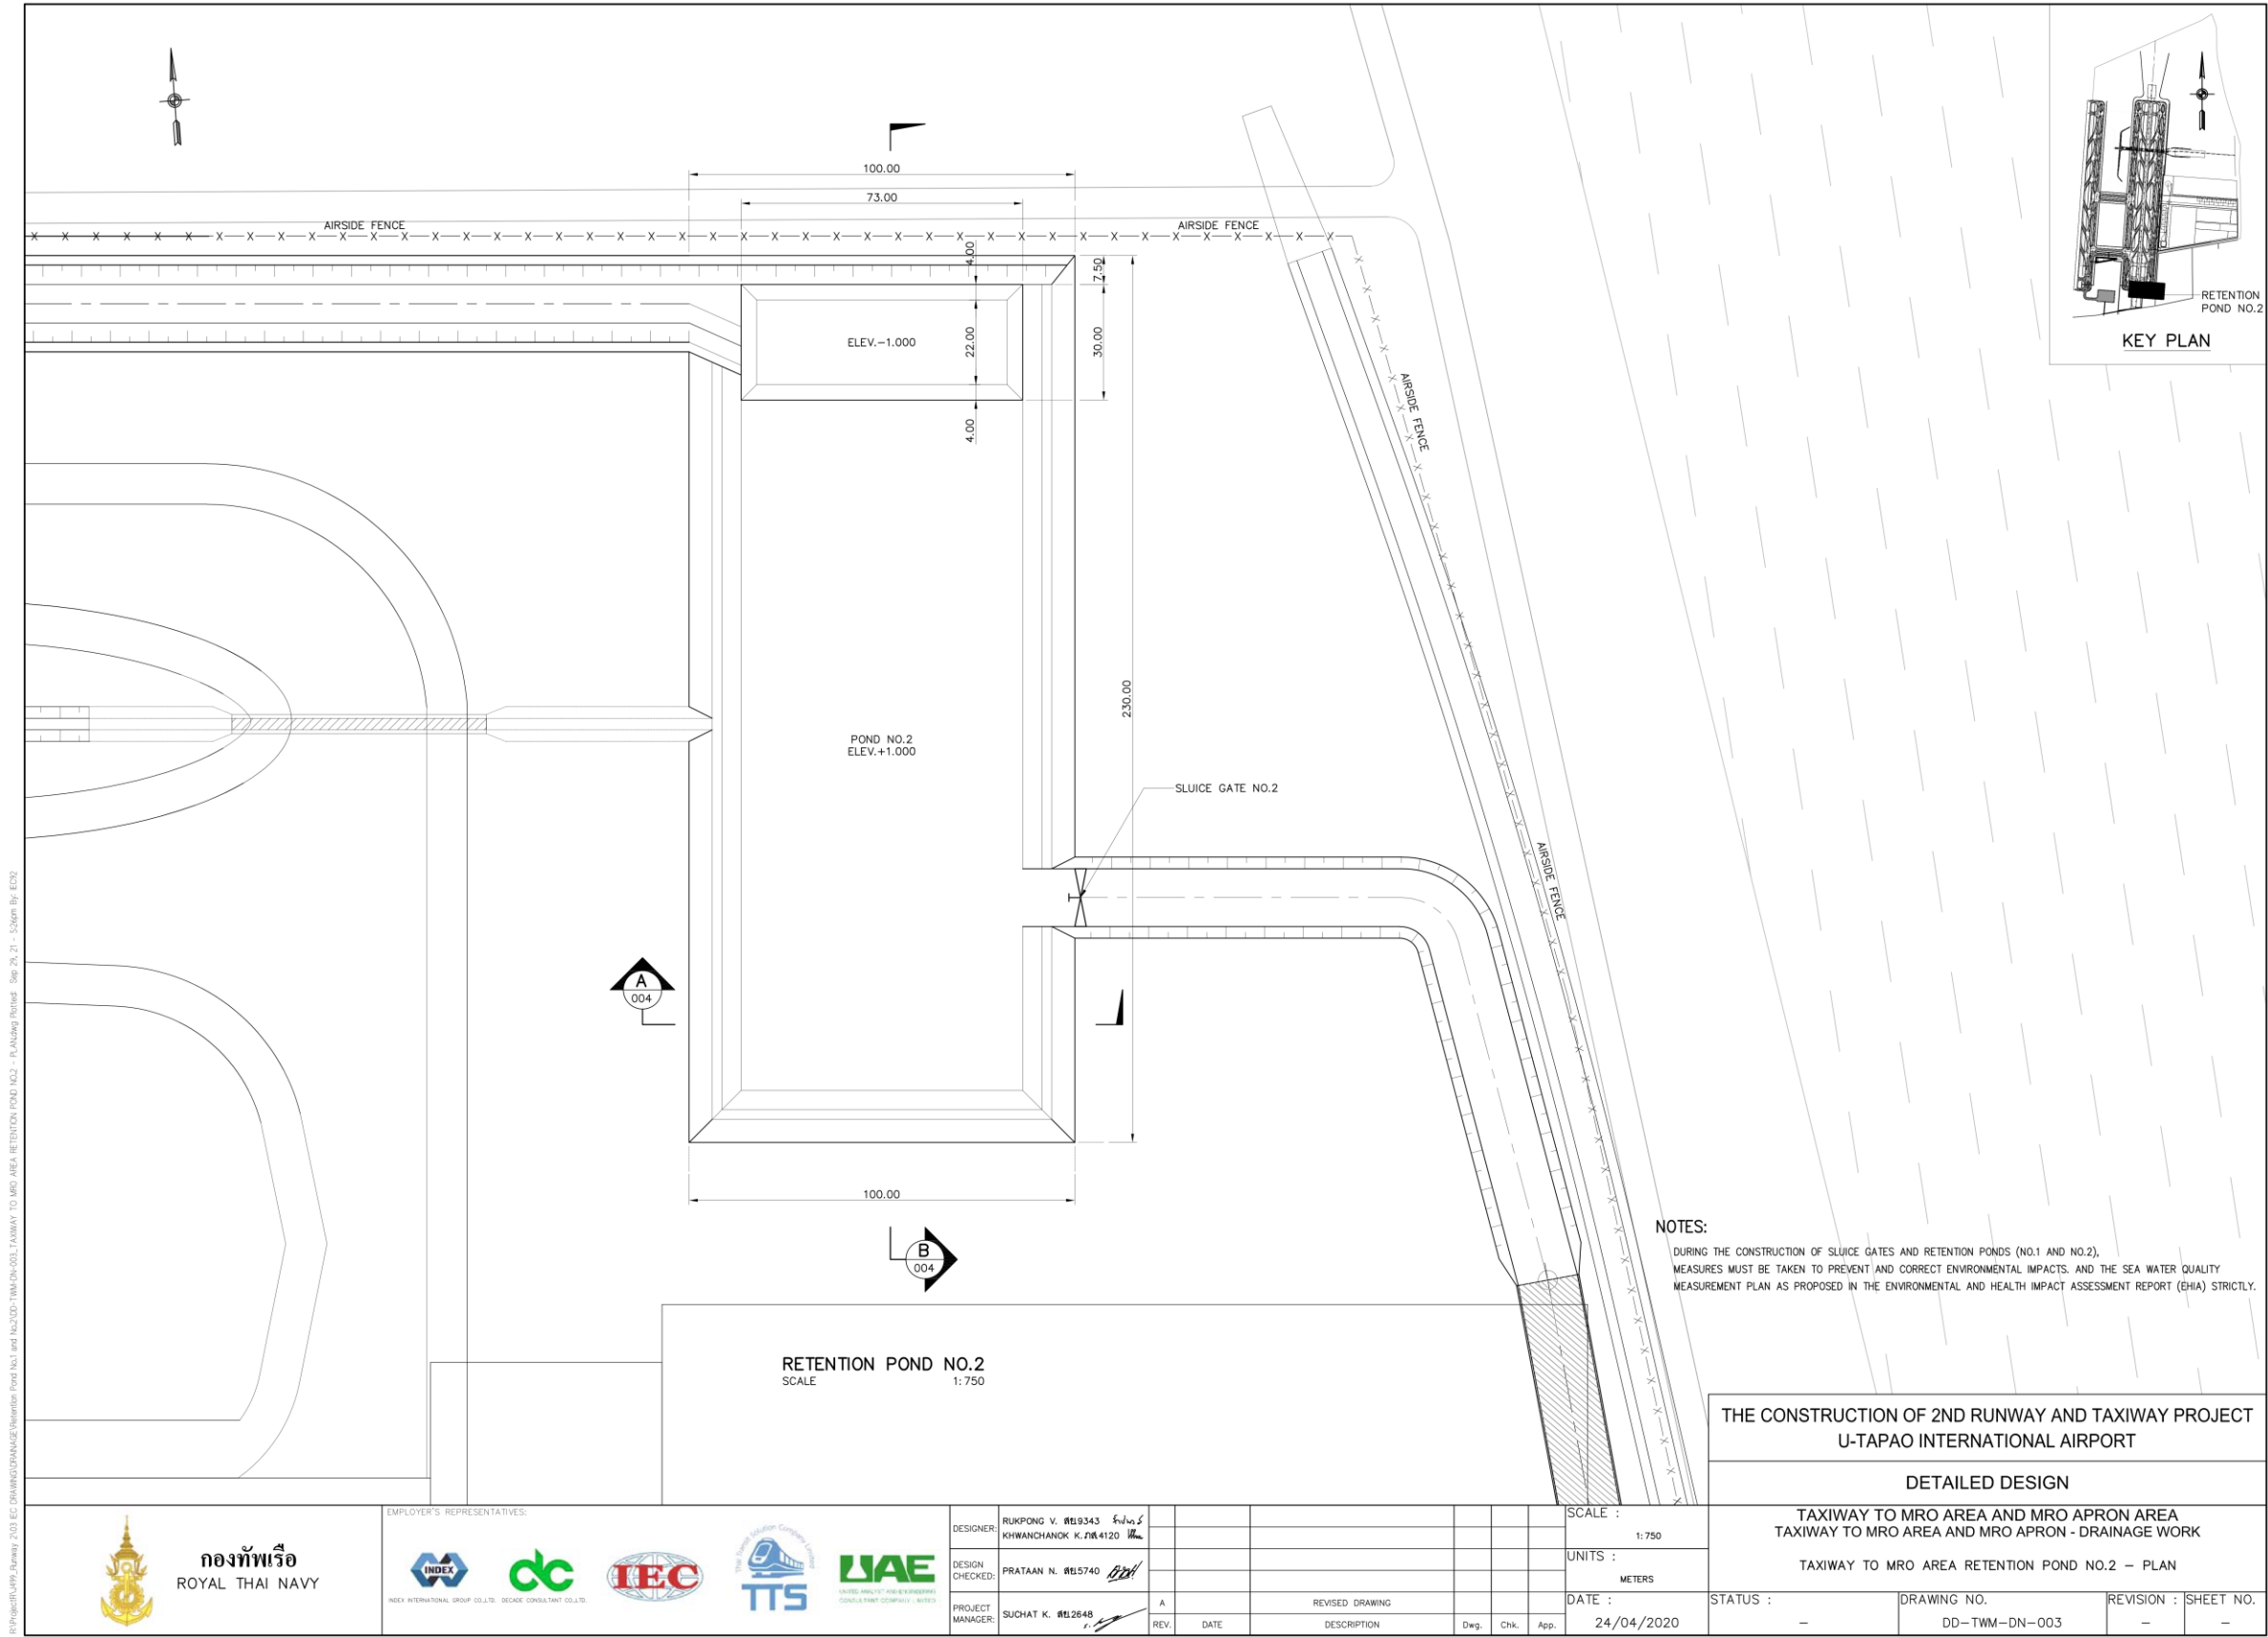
24 Image of a cut-out window showing a water drain channel with a bridge in the location of the drain gate and a description of Retention Pond No.2 appearing in the construction plan
